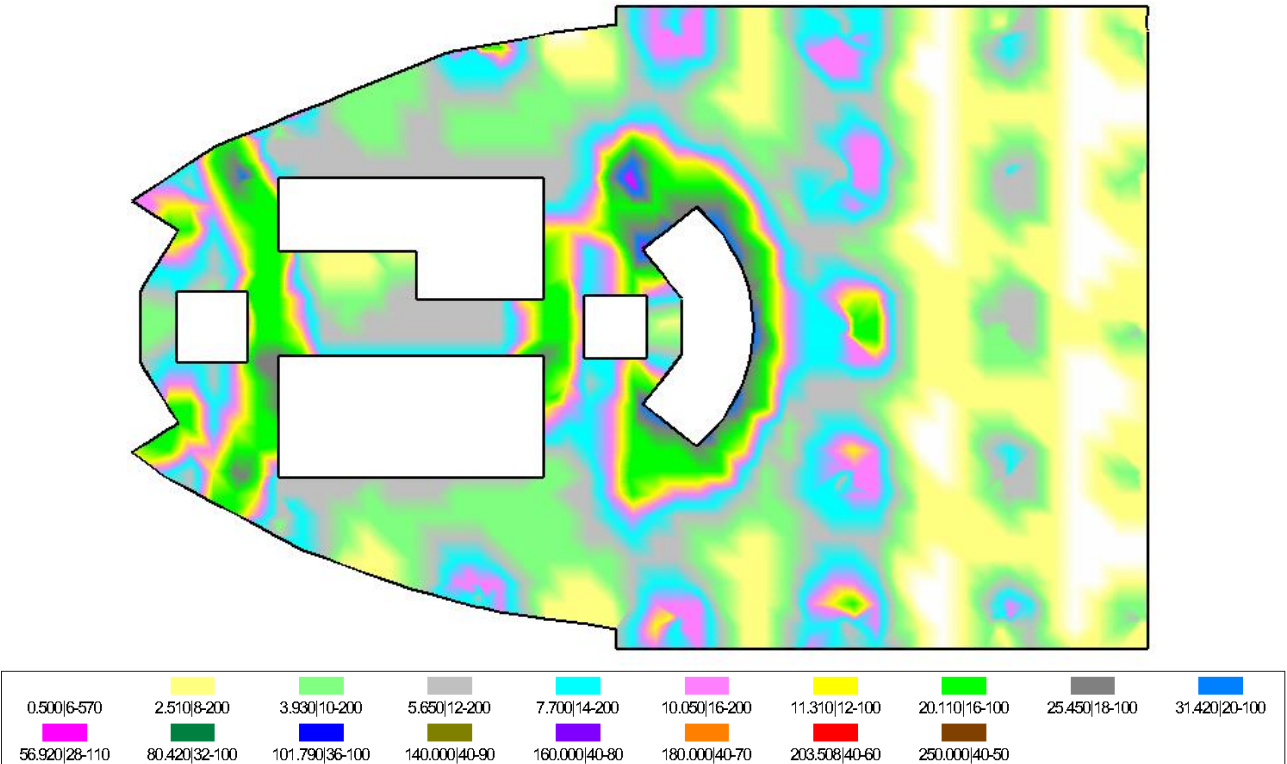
Reinforcement of the floor slab of the eastern tower at +42.80 m. Upper longitudinal reinforcement in the direction of the axis R, cm²/m [15]
